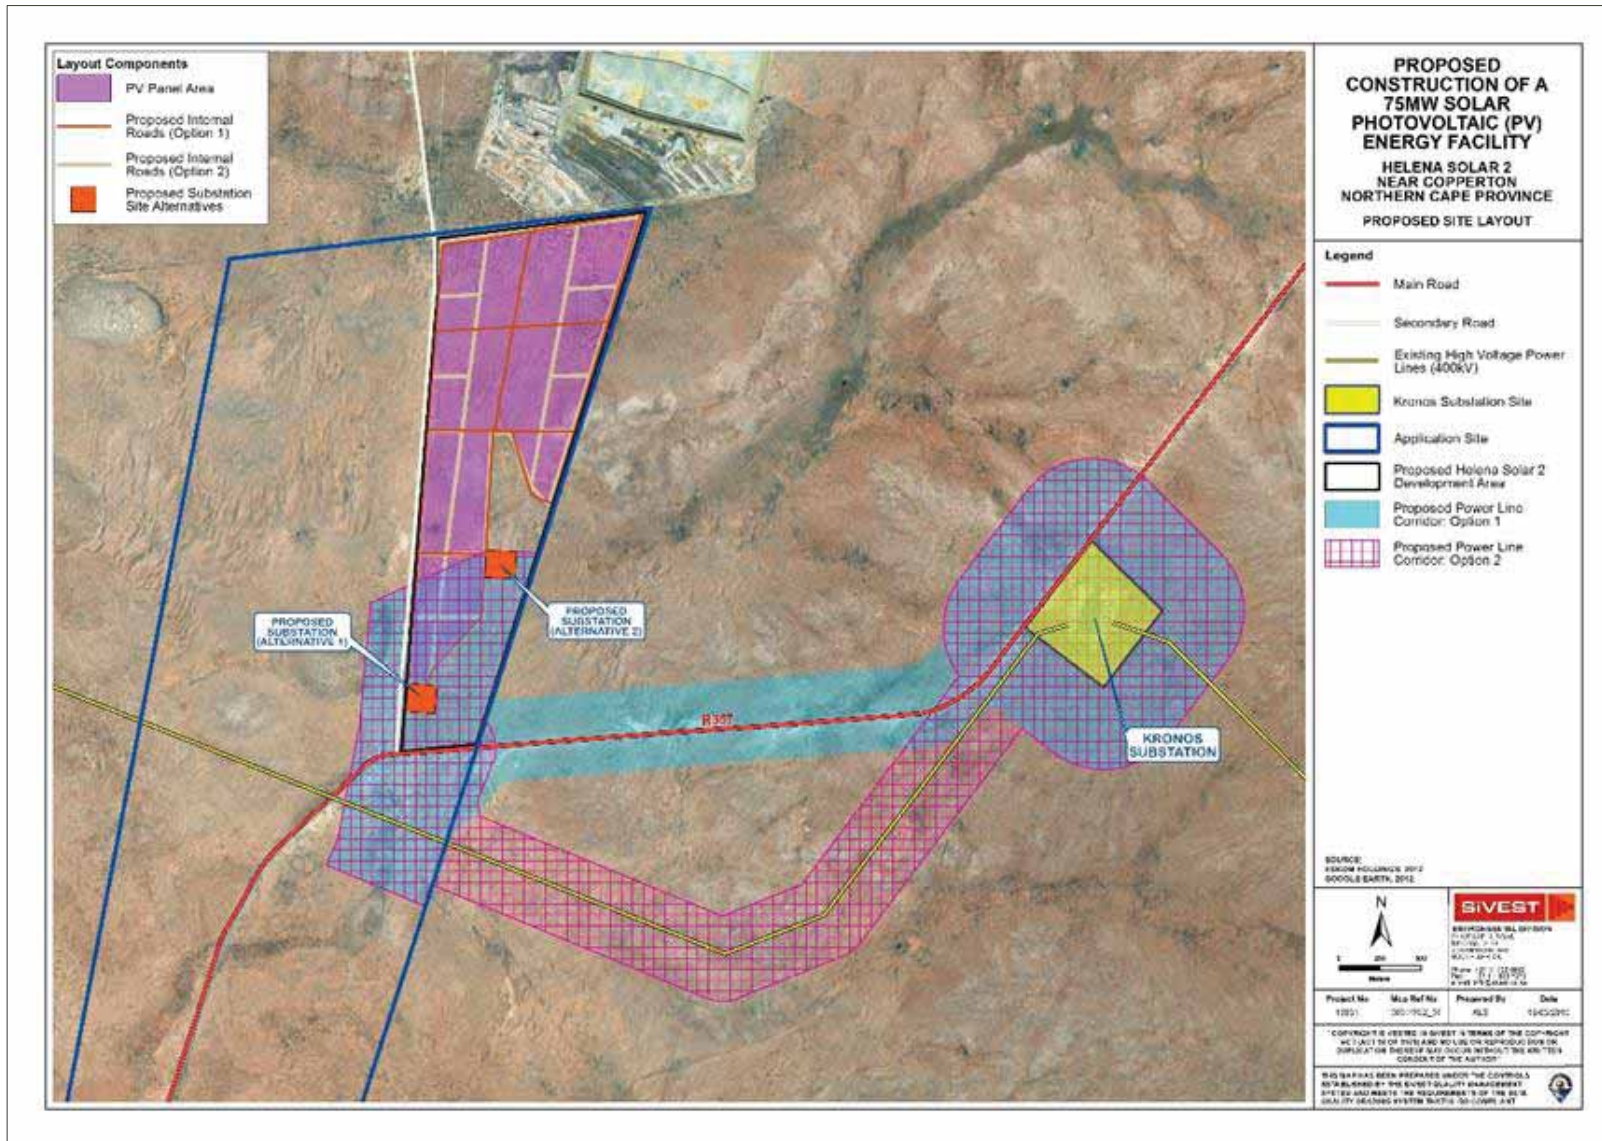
Proposed Layout Alternatives (Source: SiVEST)
